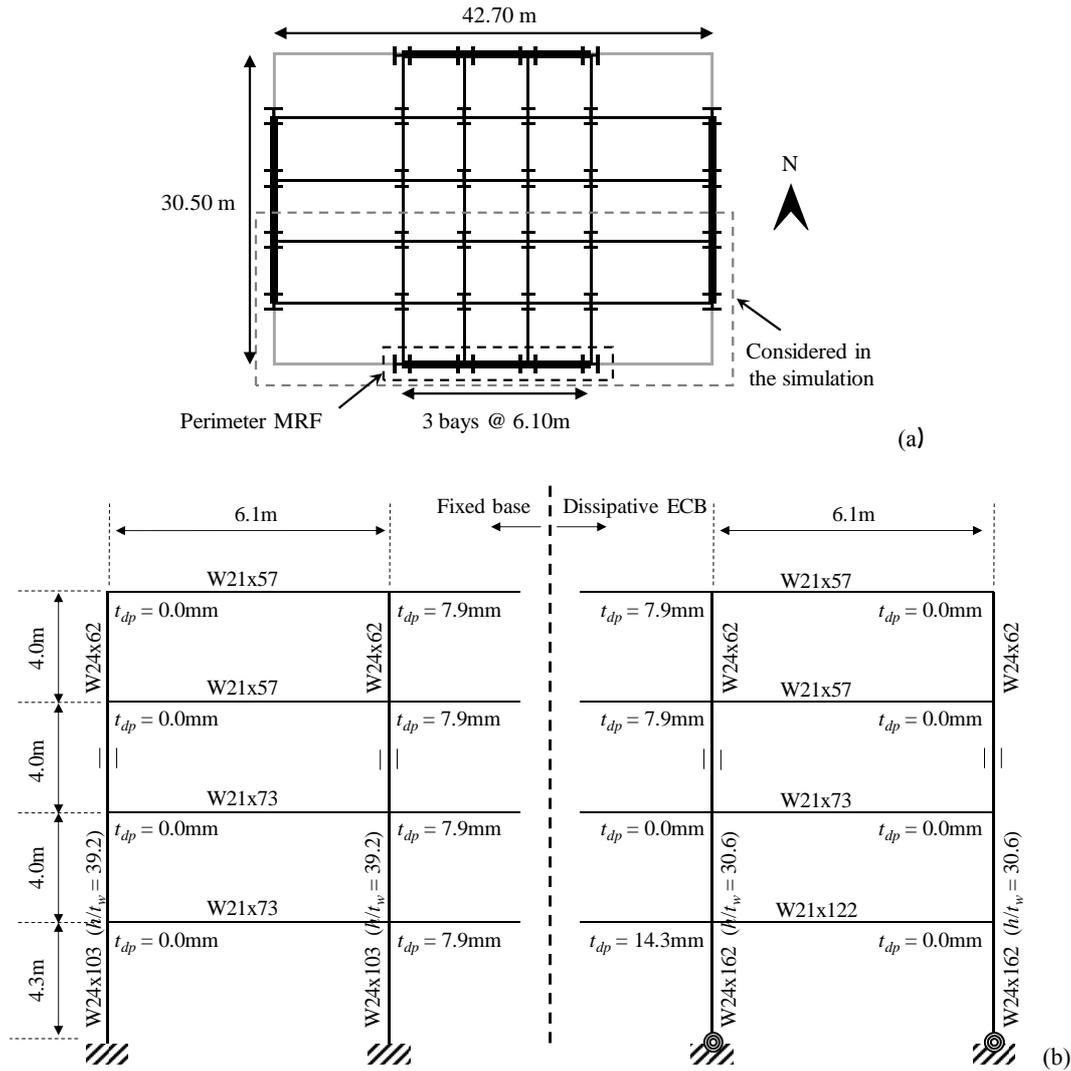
(a) Plan view and (b) elevation view of the case-study steel MRF building
